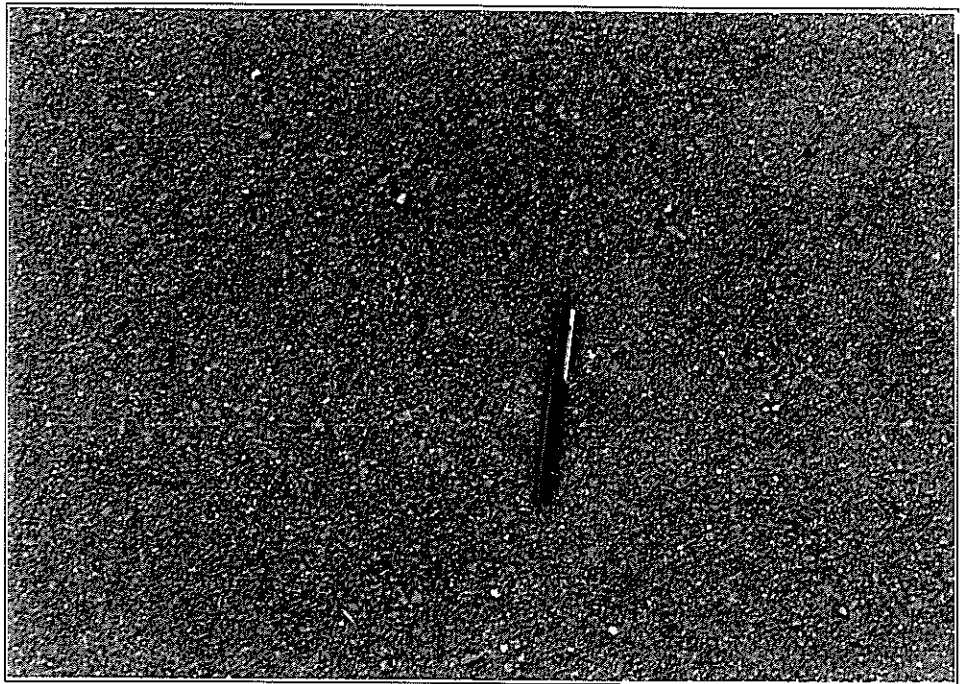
Transverse and longitudinal joint between the 9% WODB section (on left) and control section (on right) after 57 months.
